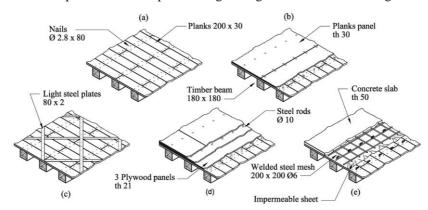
In-plane strengthening techniques for timber floors: a) layer of wooden planks on the timber beams, b) second layer of wood planks crossly arranged and fixed to the existing ones by means of steel studs/nails, c) diagonal bracing of the existing wood planks by means of steel or FRP plates, d) three layers of plywood panels glued on the existing wood planks, e) cast-in place RC slab connected with studs [17]
